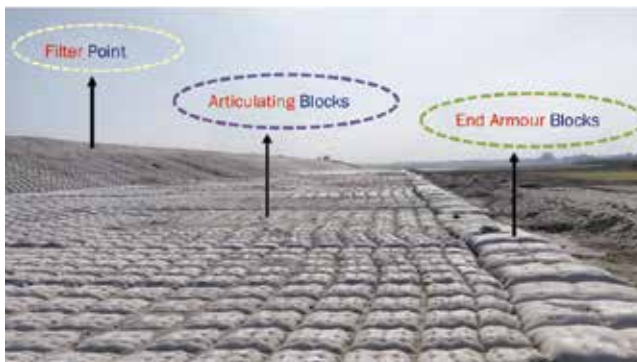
Image showing components of installed Articulating Grouted Concrete Mattress
